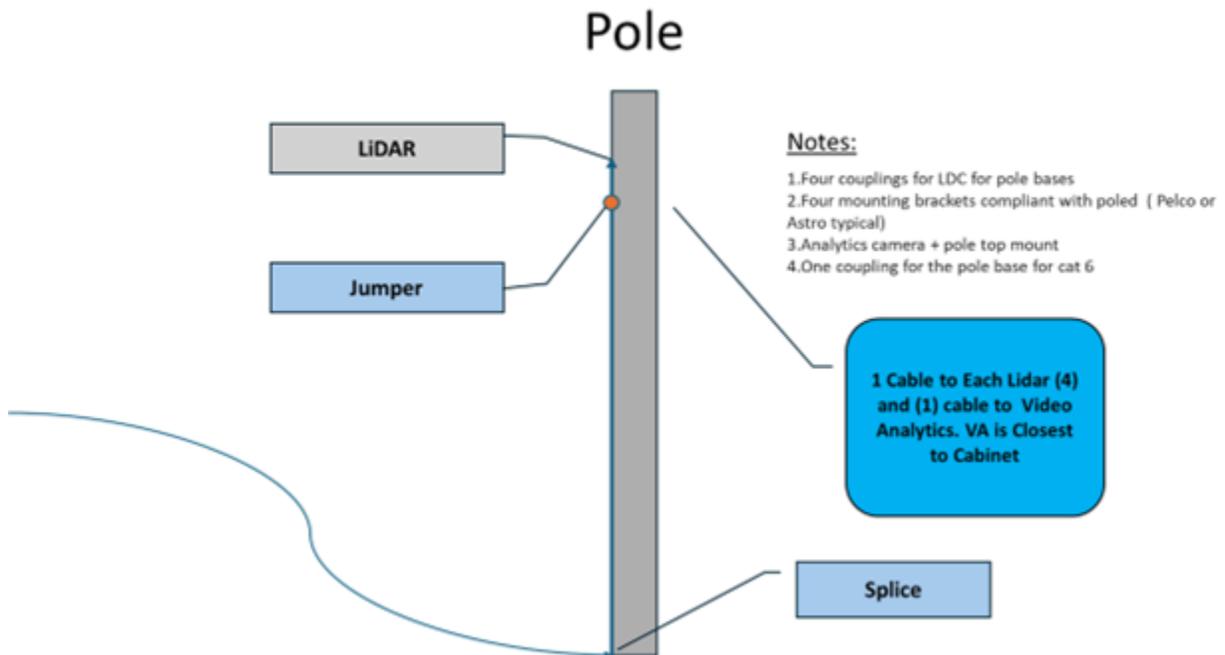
Illustration of Lidar Pole Mount Setup at NJDOT Test Site in Burlington, NJ
